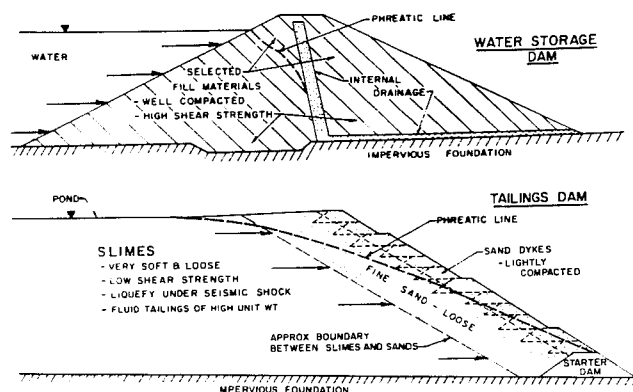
Comparison Between Conventional Water Storage Dam and Tailings Dam Built Using an Upstream Method of Construction
